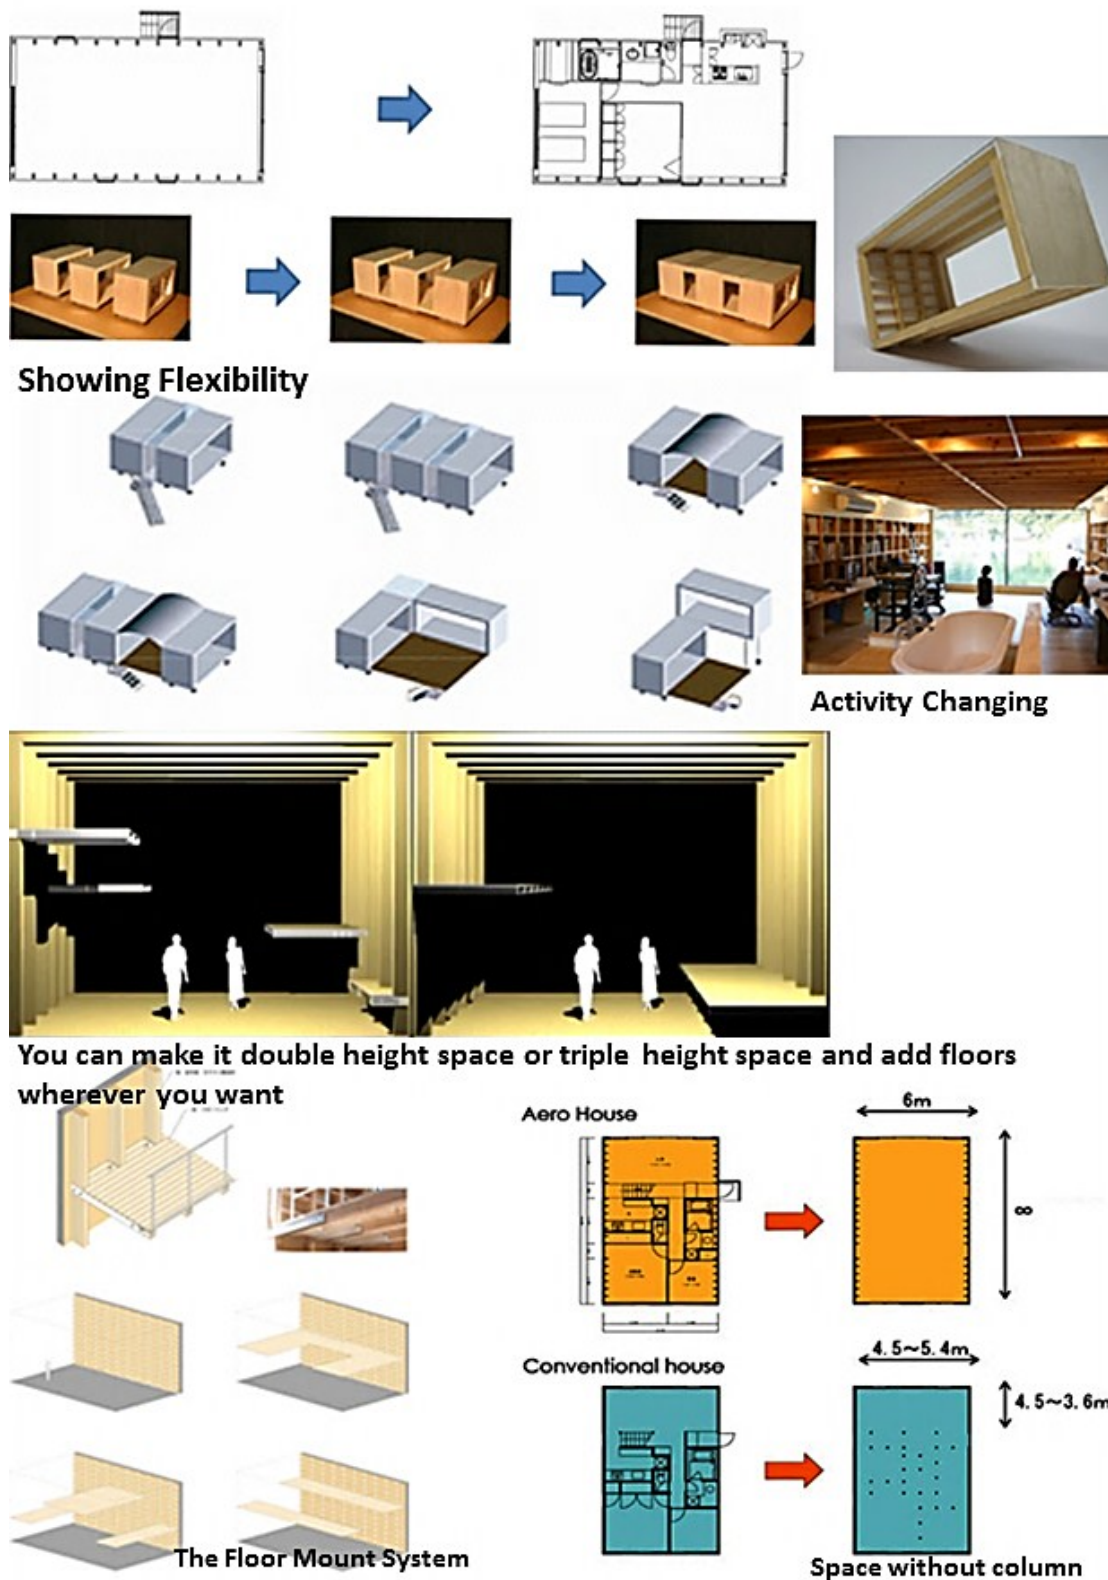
Conceptual design and built prototype of AH (<http://www.aerohouse.net/>).
